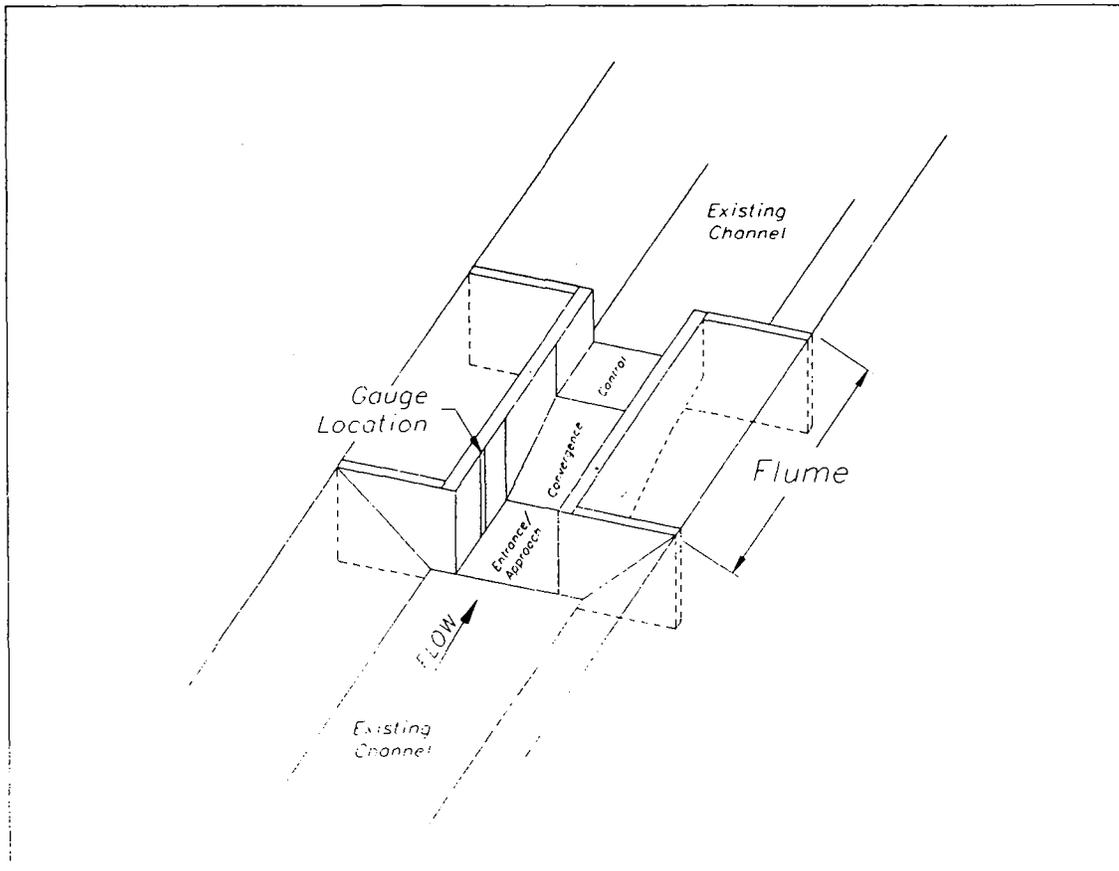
Three dimensional view of the typical flumes to be constructed at the new measurement sites #4, 4a, and 5.
